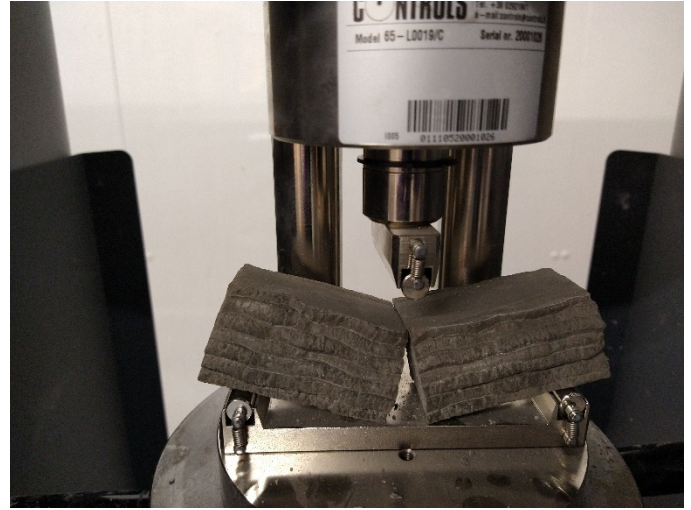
Failure under flexural strength test for specimen printed by piston based extruder (left) and auger screw based extruder system (on the right)
